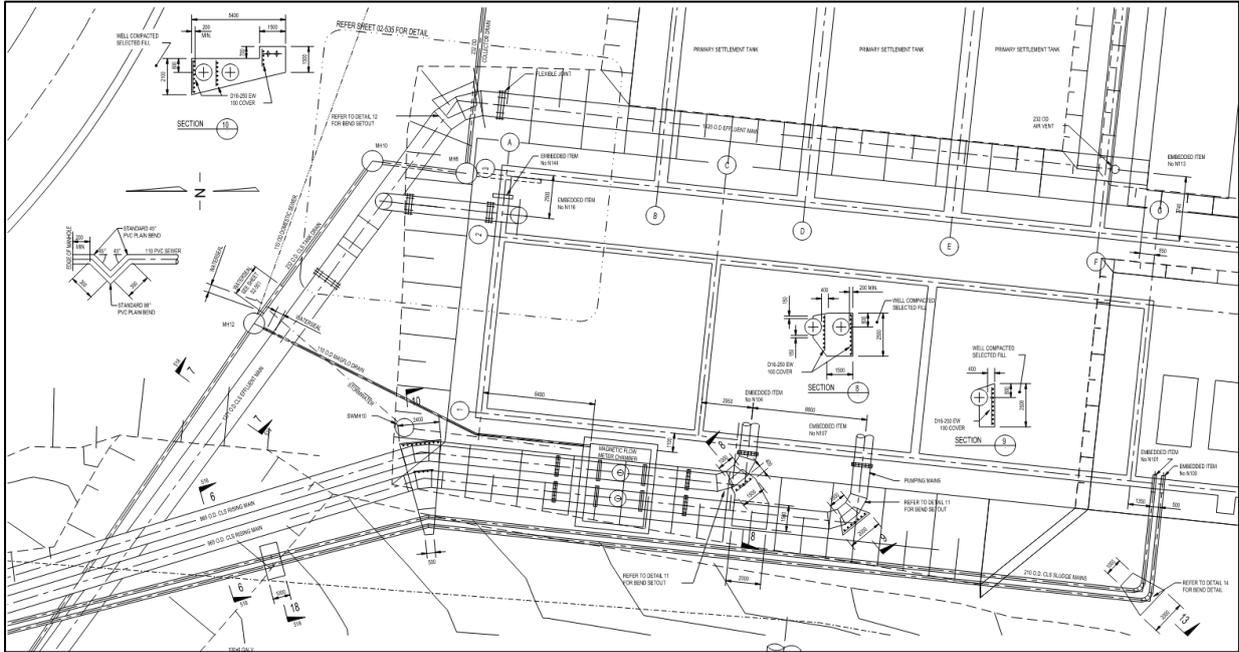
Inlet Works Piping Plan (Extracted from Moa Pt WWTP As Built 02-552)
